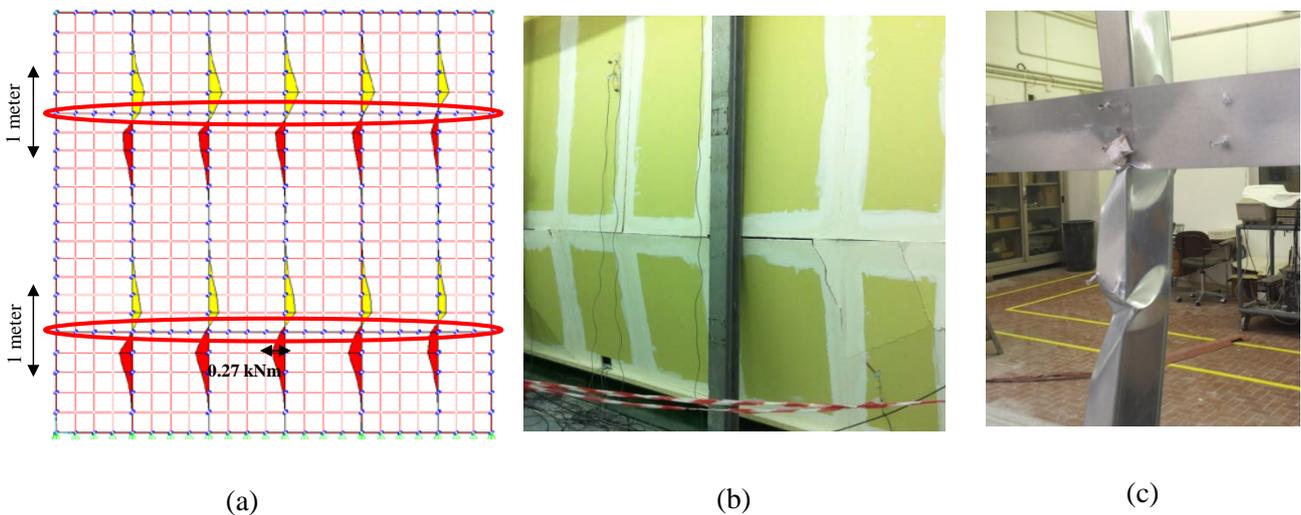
(a) Bending moment diagram at a 68 mm top displacement and crossing horizontal joints (in red circles) (b) out of plane failure on the partition and (c) observed damage on stud across the horizontal joint
